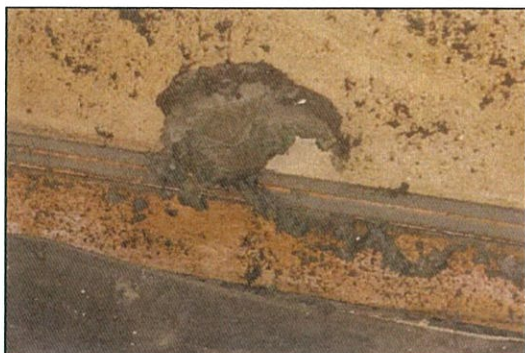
Close-up of what appears to be a terminate nest above the skirting board, Bedroom 1. Note also the presence of mould.
